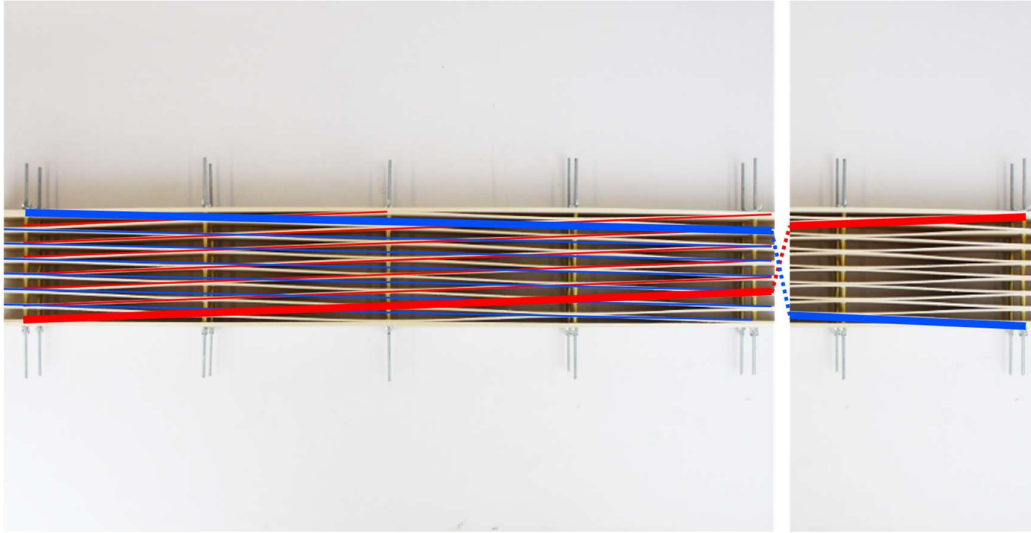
Helically force flow through the superstructure. The bent panels create a truss system enabling forces in the horizontal as well as the vertical plane.
